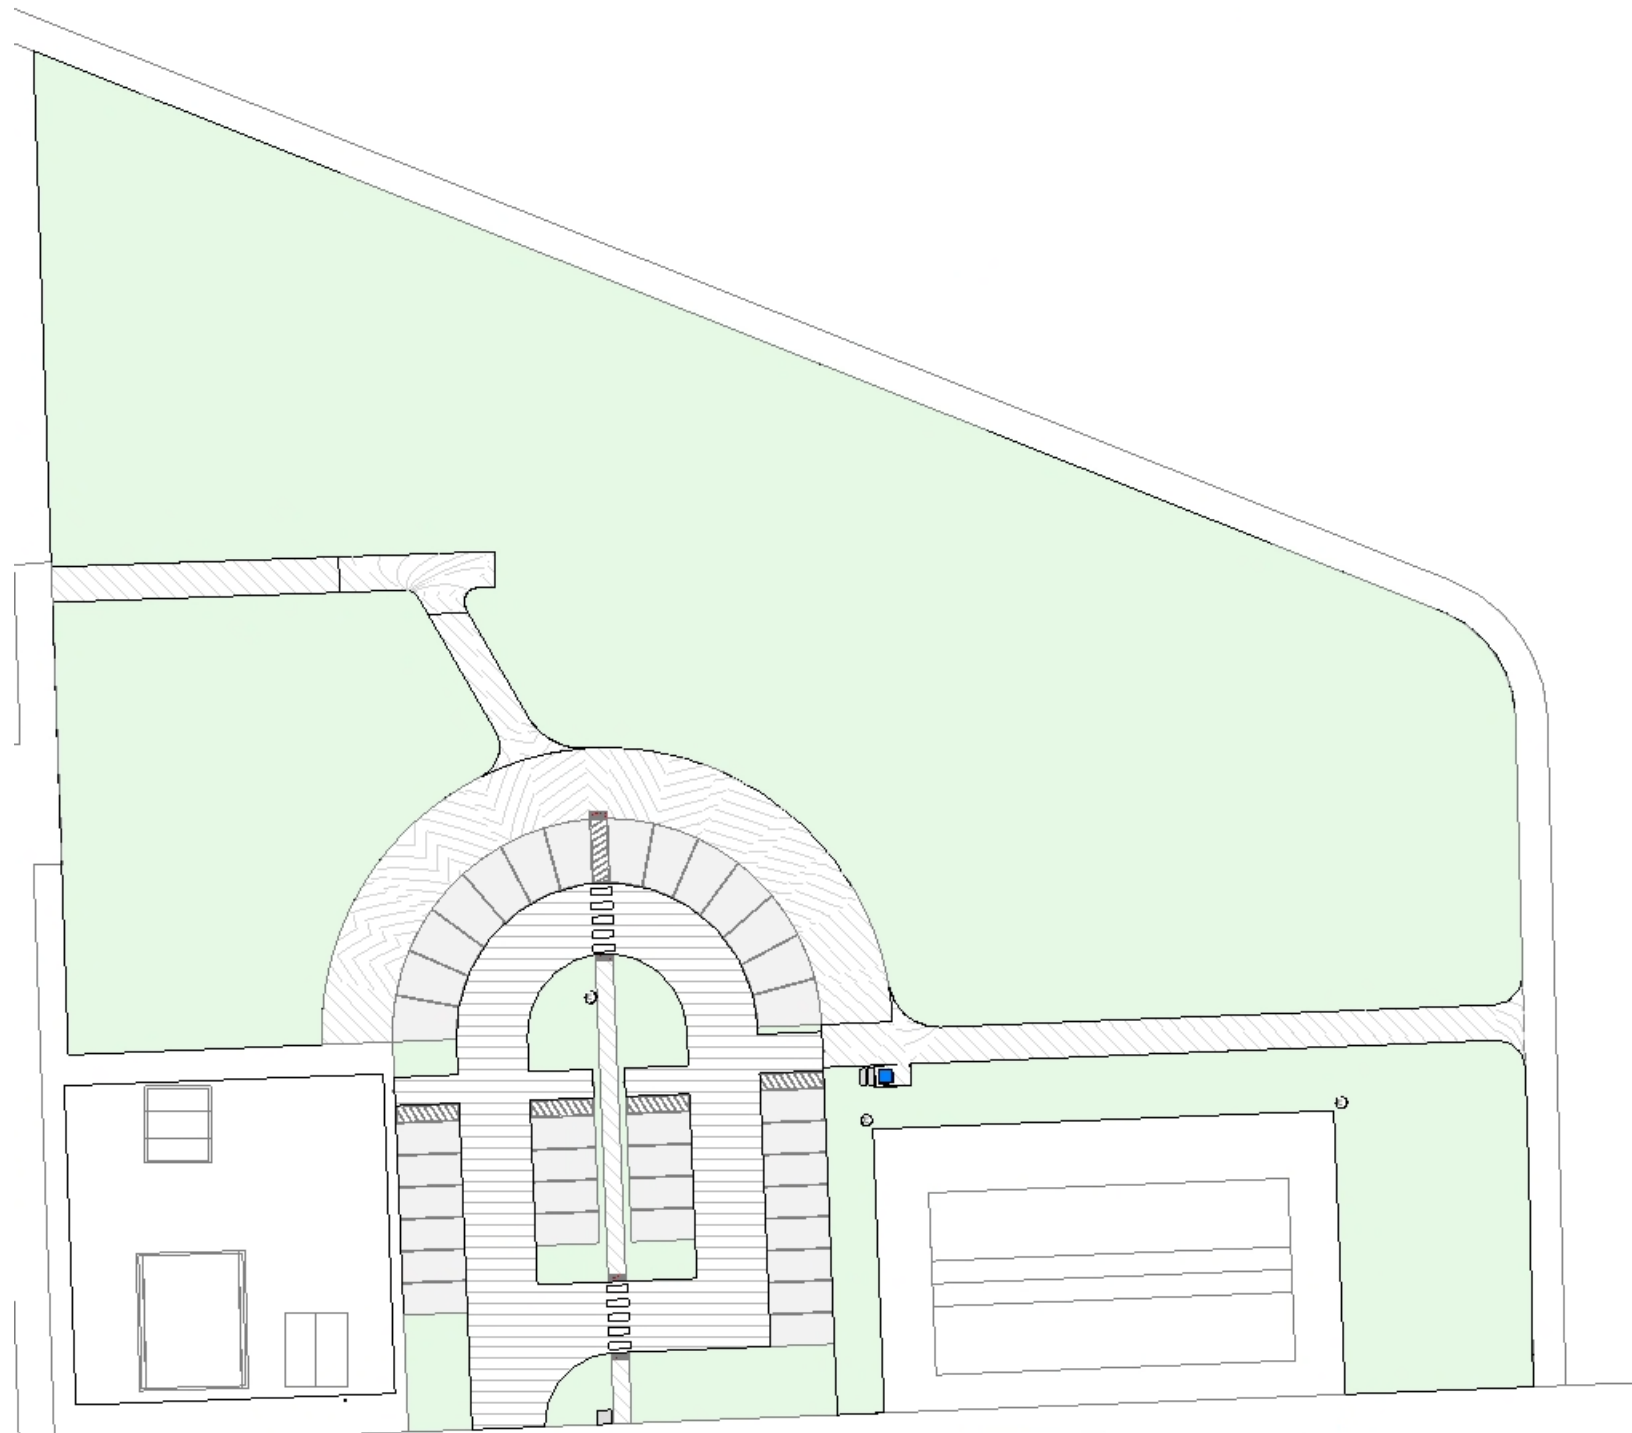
First phase of 10' trail construction connecting the Farmer's Market parking lot structure to the existing sidewalk on the southern side of the site and the existing trail network to the north.
